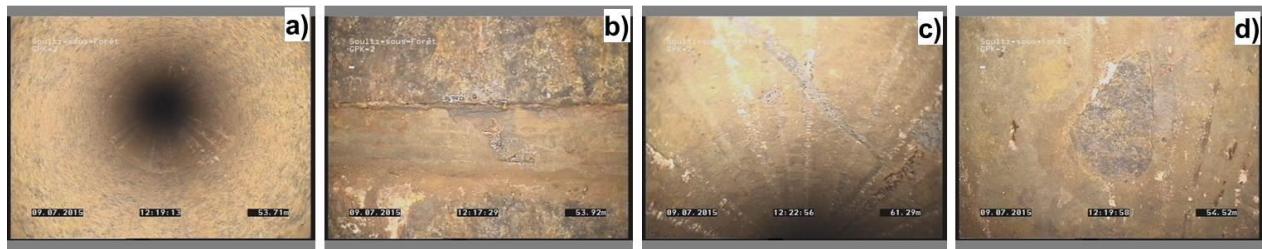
Casing interior of GPK-2 above the water level between 53 and 62 m. a) View into the well. b) Casing joint. c) Casing wall covered with scalings. d) Scale on casing wall.
